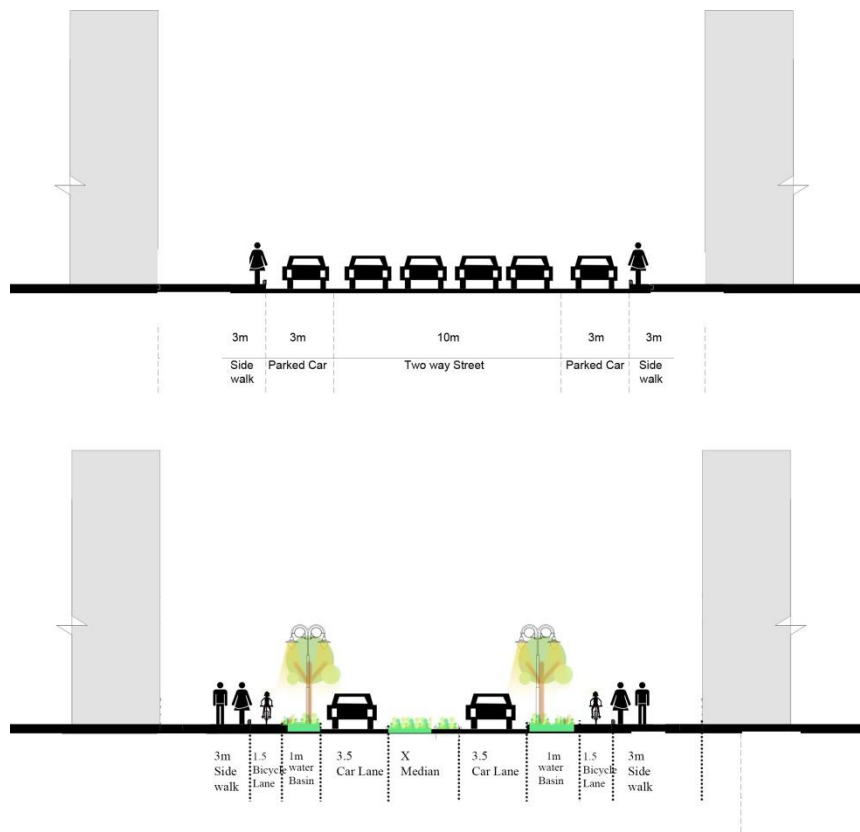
Before and after of the street section (Secondary artery). Source: Author.
